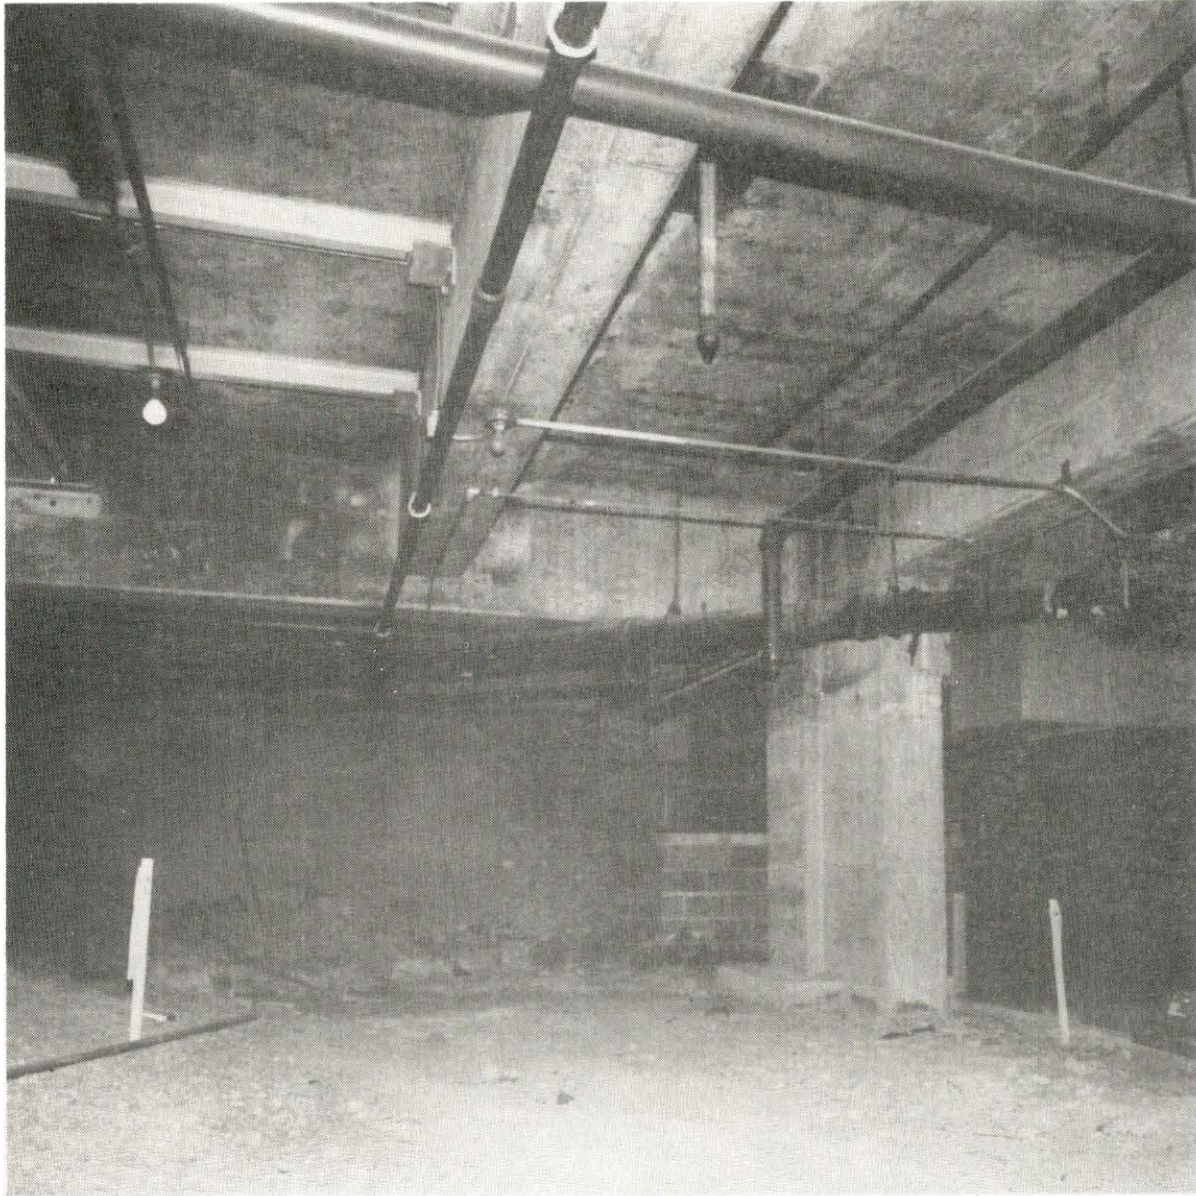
East end basement of Building 9204-1, looking north into Section II.
